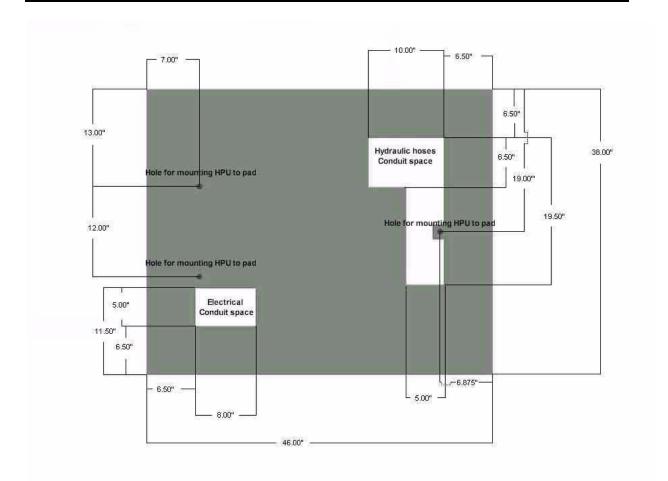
Dimensions of concrete pad with conduit spaces for 6118 & 6119
